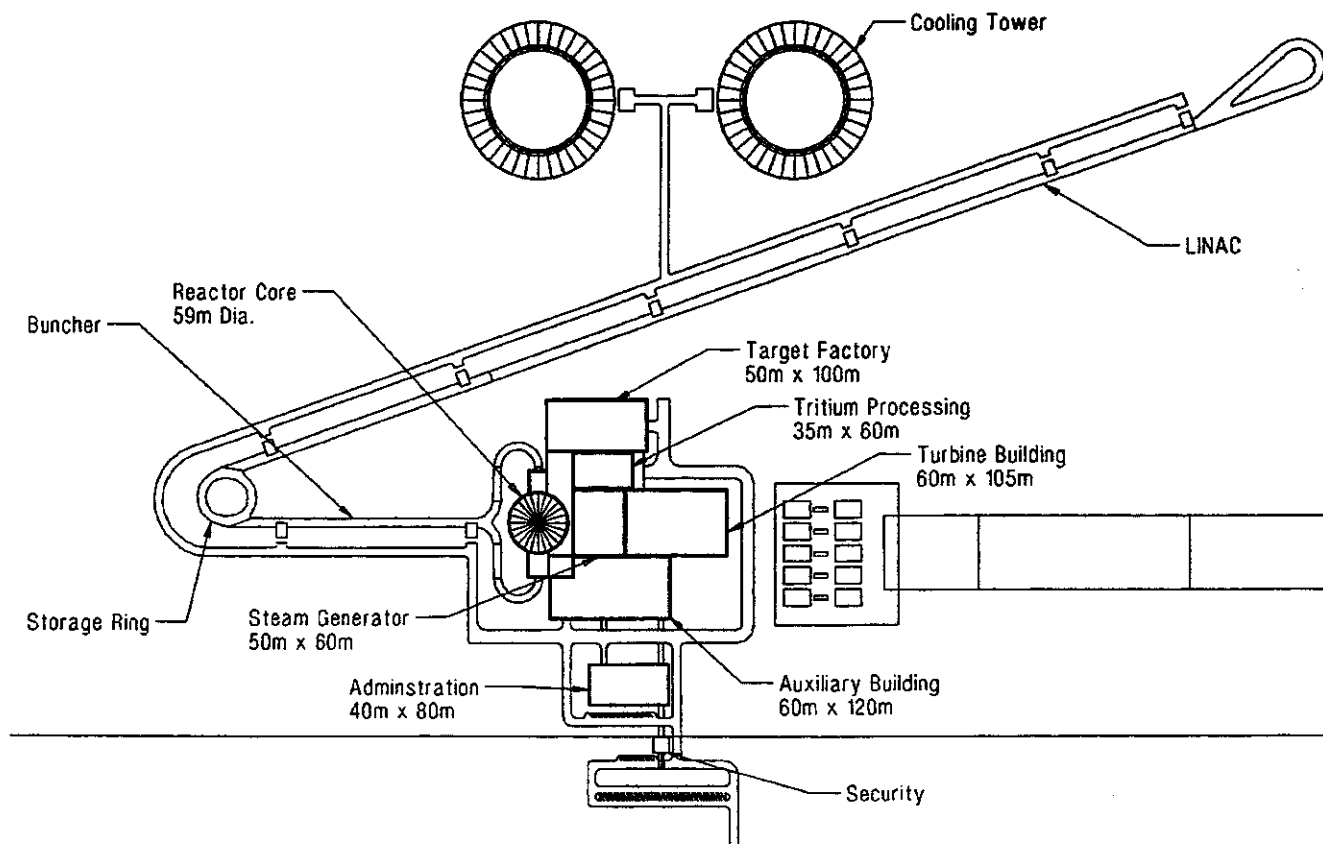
Prometheus-H Plant Site Plan View
